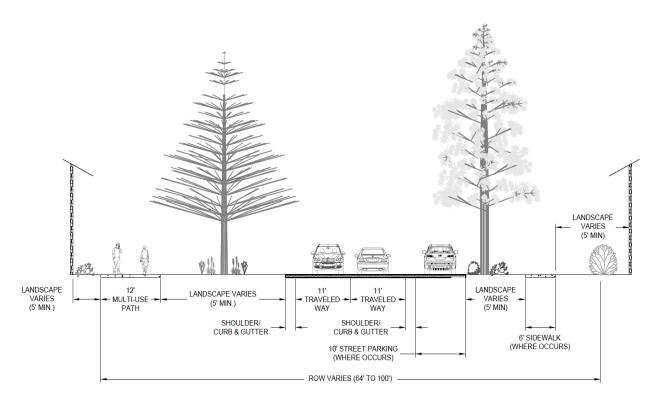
Typical Road Section (Chaparral Road, Tavern Road & Center Street)
